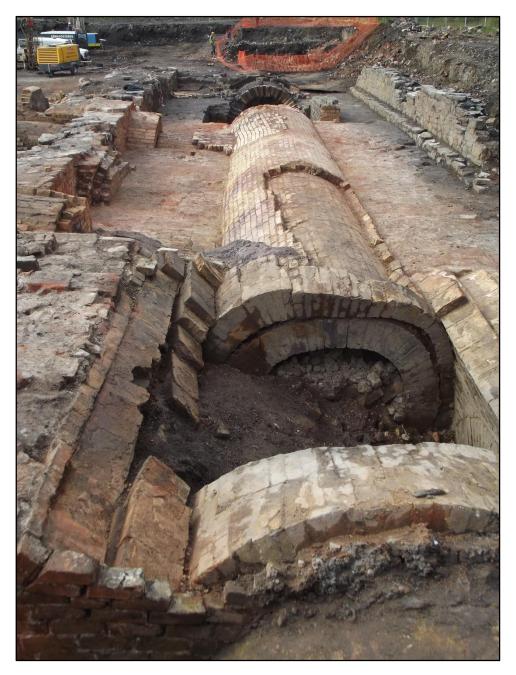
North Coppée coke oven flue complex, showing the arrangement of walls and floors to create a substantial 'cradle' in which to construct main gas flue 2448. Junction base 2464 is closest to the camera. View to west.
